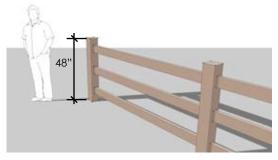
Concrete split rail fence between trail and rural residential parks, and open space
